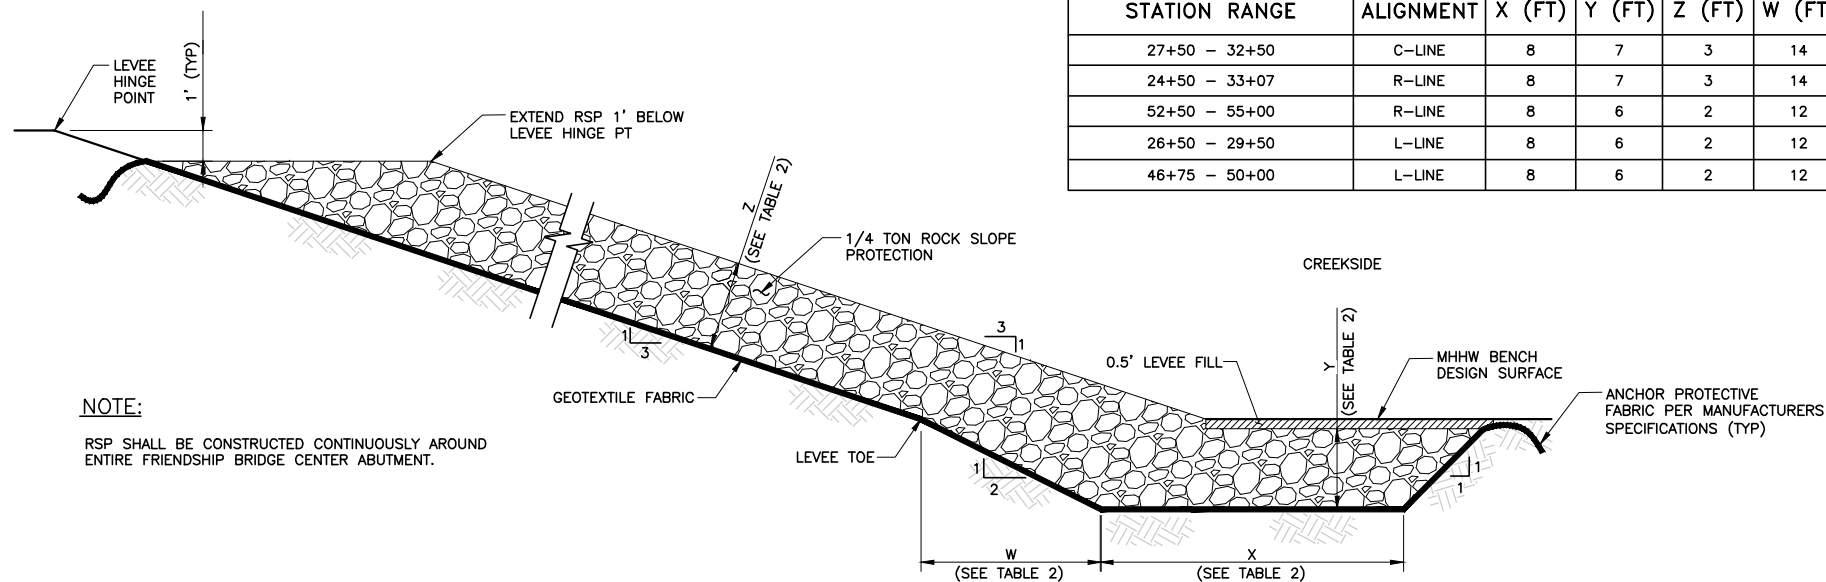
ROCK SLOPE PROTECTION AT FLOOD WALL
